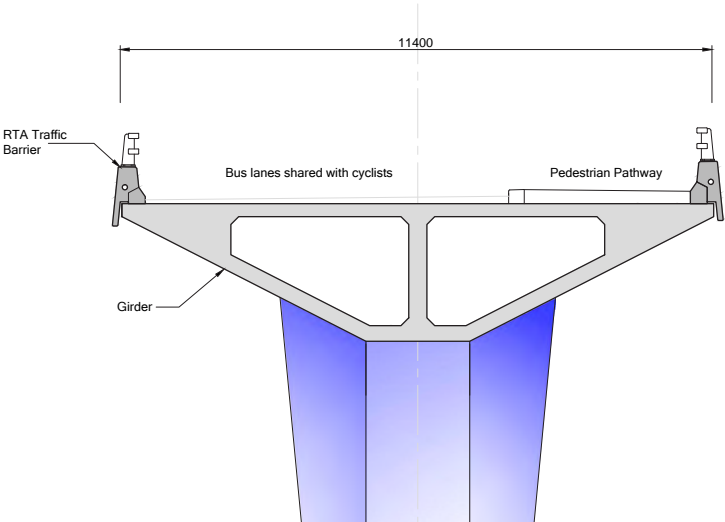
Option 4: Tapered soffit box girder bridge (preferred option)
